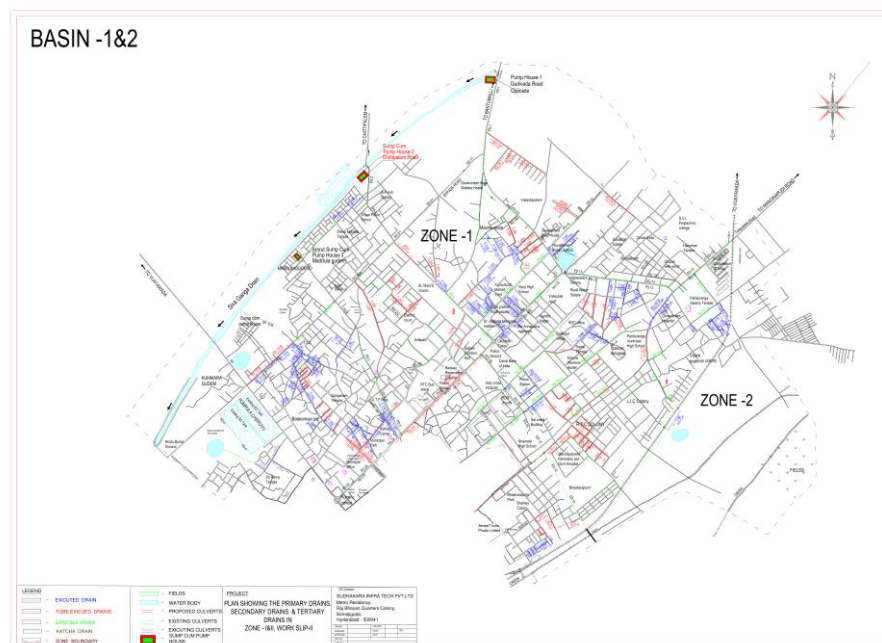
Storm Water Drainage Plan for Basin 1&2 (Source: Municipal Corporation, 2025)
